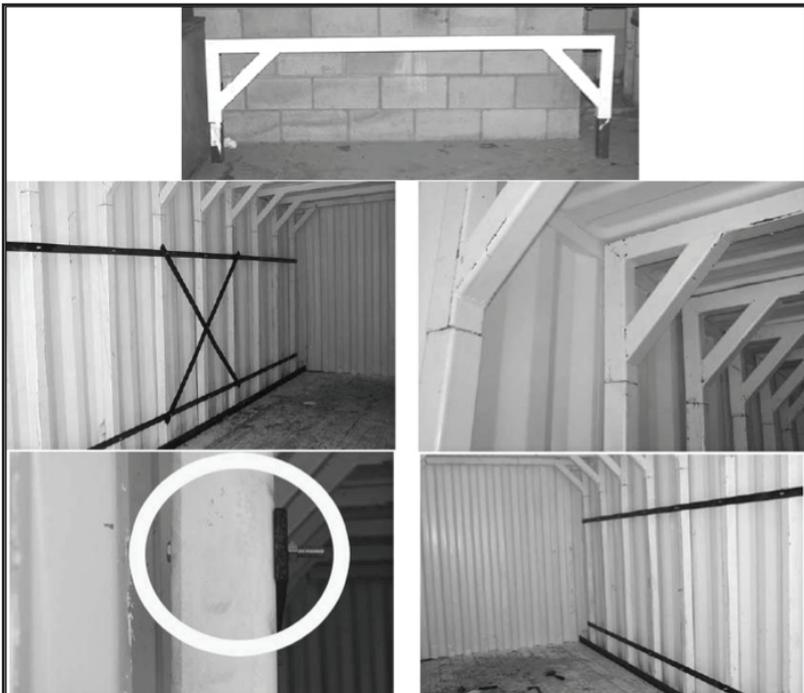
Underground bunker steel frame reinforcement assembly. Steel frame assembly and installation (clockwise from top: Upper portion of frame; frames installed at 2' o.c.; flat bar strips attached to frames; flat bar connected to frame with bolt-- note bolt head is on outside of frame; diagonal bracing in place)
